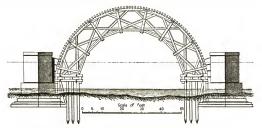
The timber centring for the central arch of Westminster bridge; span 76 ft. 1739.
